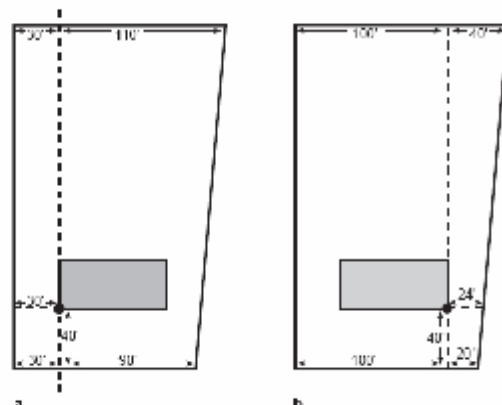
Sight along one side of house to locate points for positioning house on plan. Any corner may be used where objects do not interfere with sighting. For example, locate corner of house relative to (a) a square corner of the lot, or (b) an angled corner.
